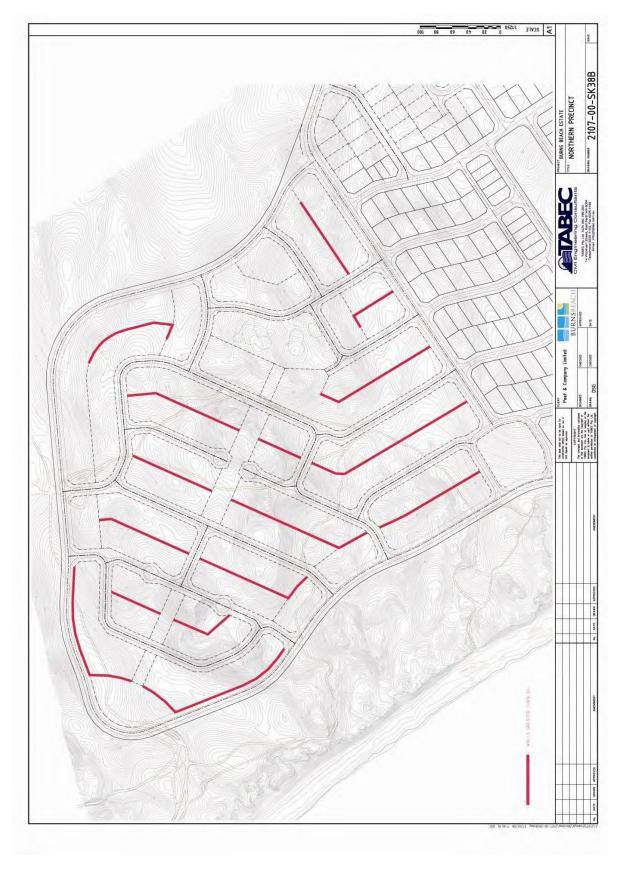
Retaining Walls Permitted to a Height of 4.0m
